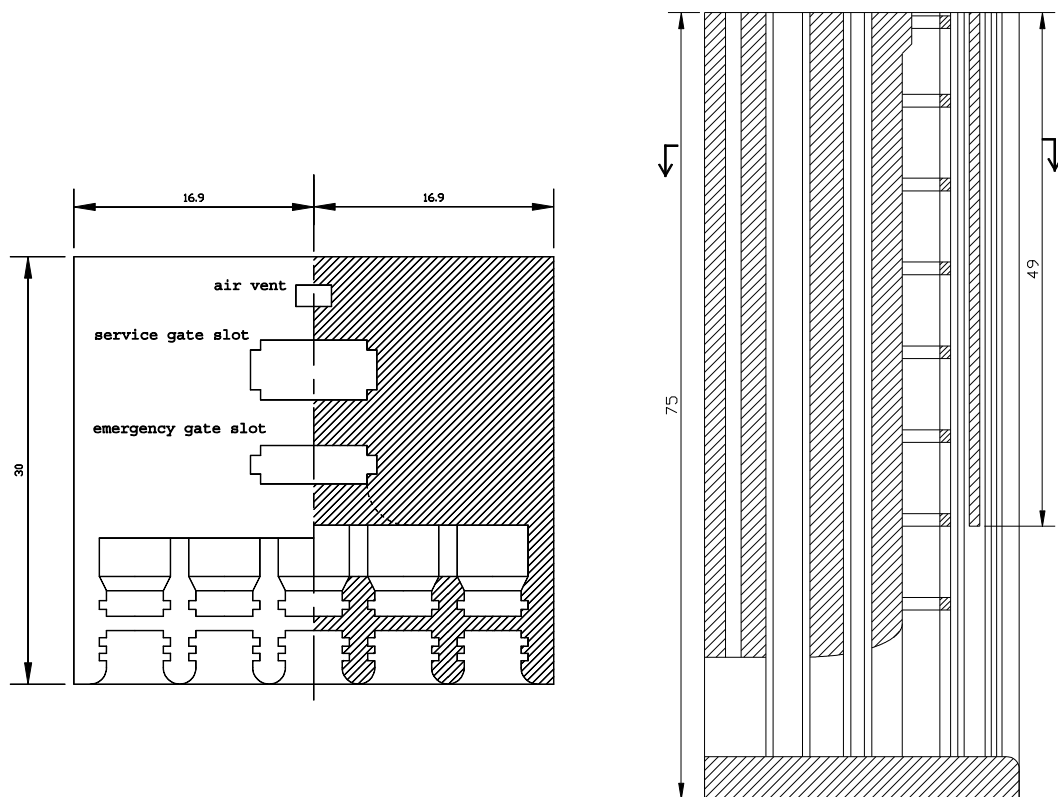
Drawing of horizontal and vertical cross-section of the middle towers
